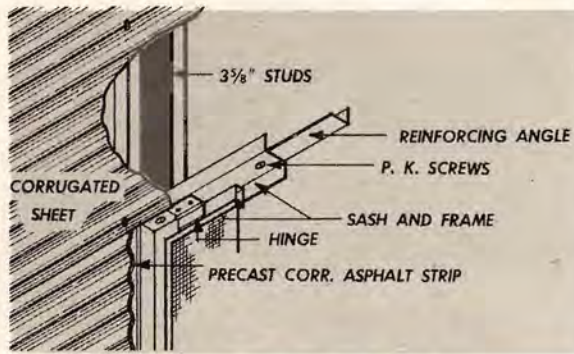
DETAIL SHOWING BULKHEAD CORRUGATED SHEET LAP
